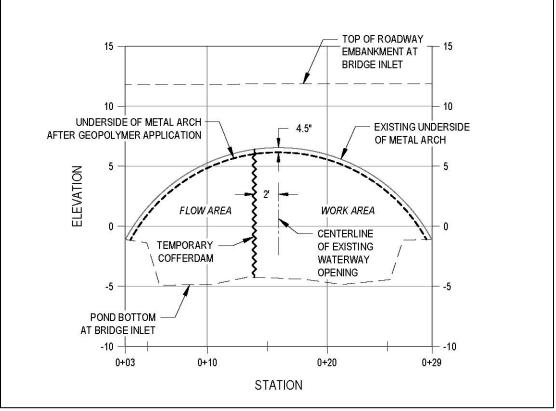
Water Diversion Alternative 3 Bridge Inlet Cross-Section
